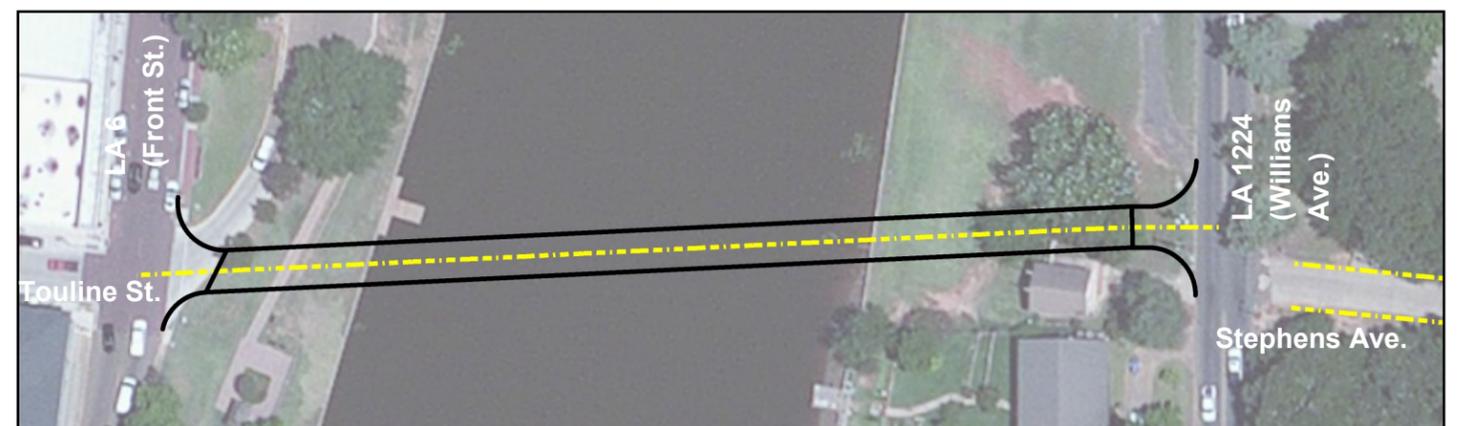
Proposed Temporary Bridge at Toulaine Street
